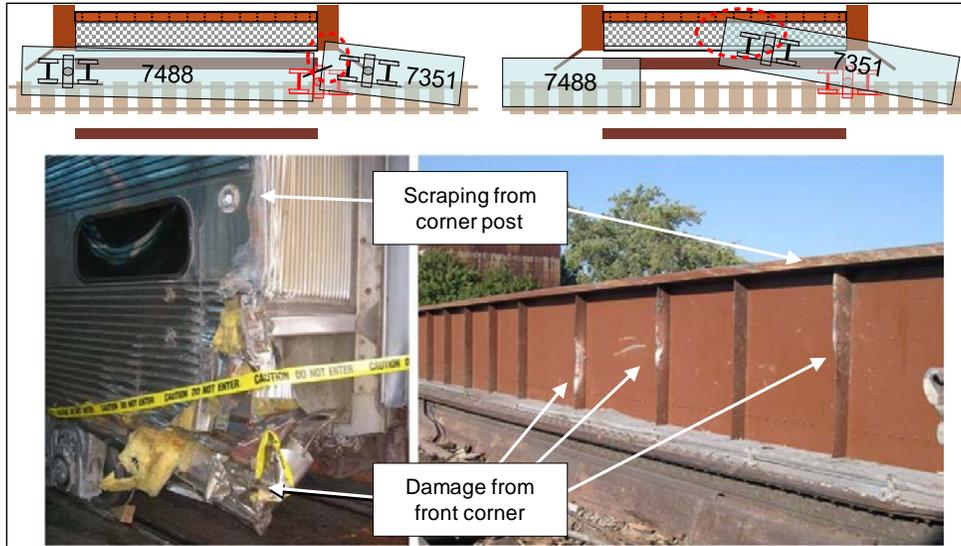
Front of Car 7351, Showing Damage from Impact with Bridge Girder (left) and Damage to the Gussets of the Retaining Wall (right)
